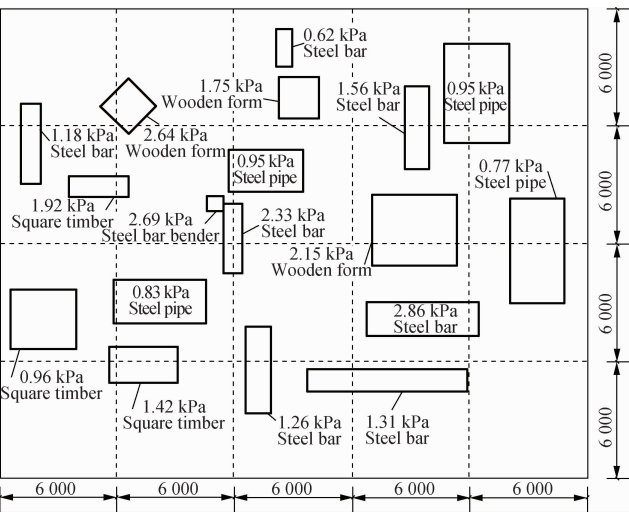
VML investigation and standardization results of construction site 2 (unit: mm)
